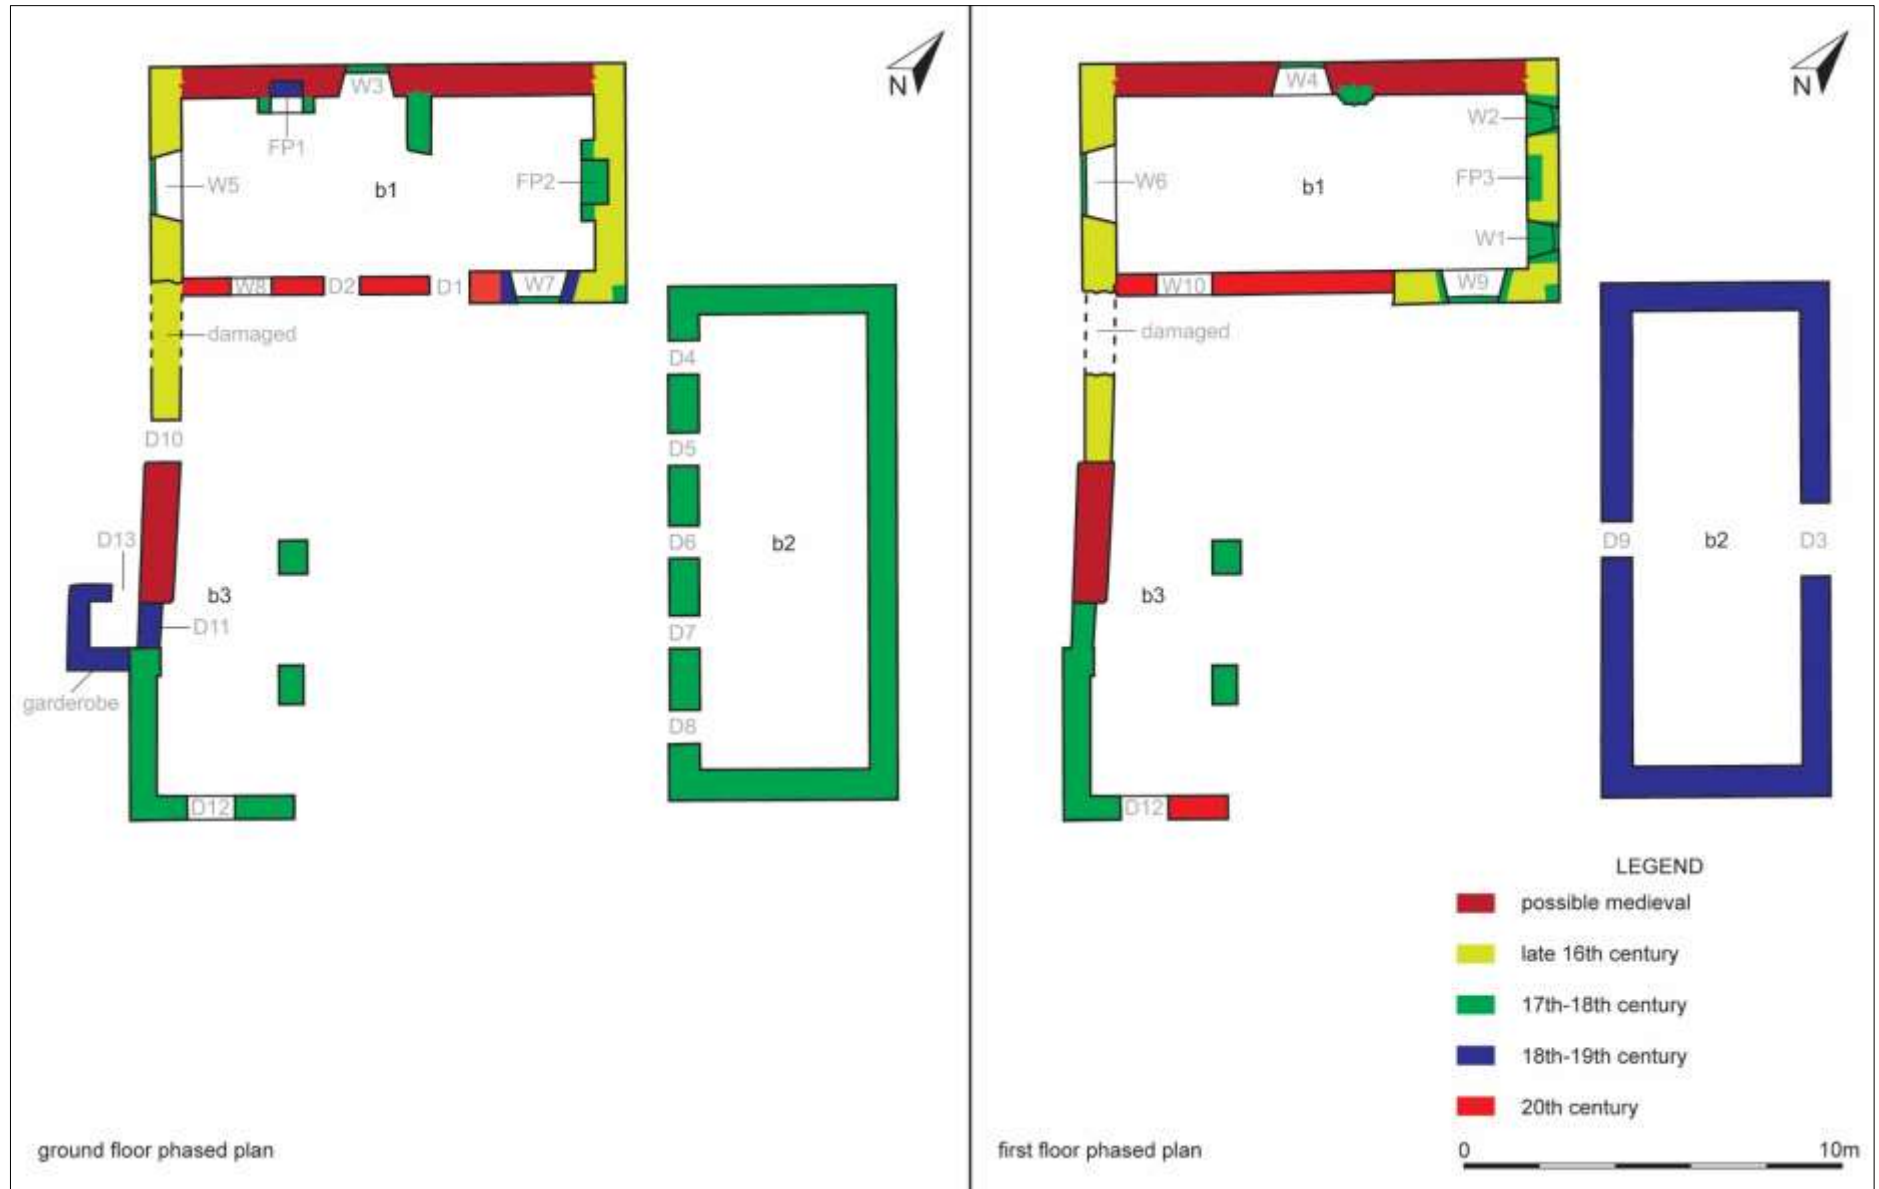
GROUND-FLOOR AND FIRST-FLOOR PLANS SHOWING DEVELOPMENTAL PHASING AND POSITIONS OF FEATURES DESCRIBED IN THE TEXT.
